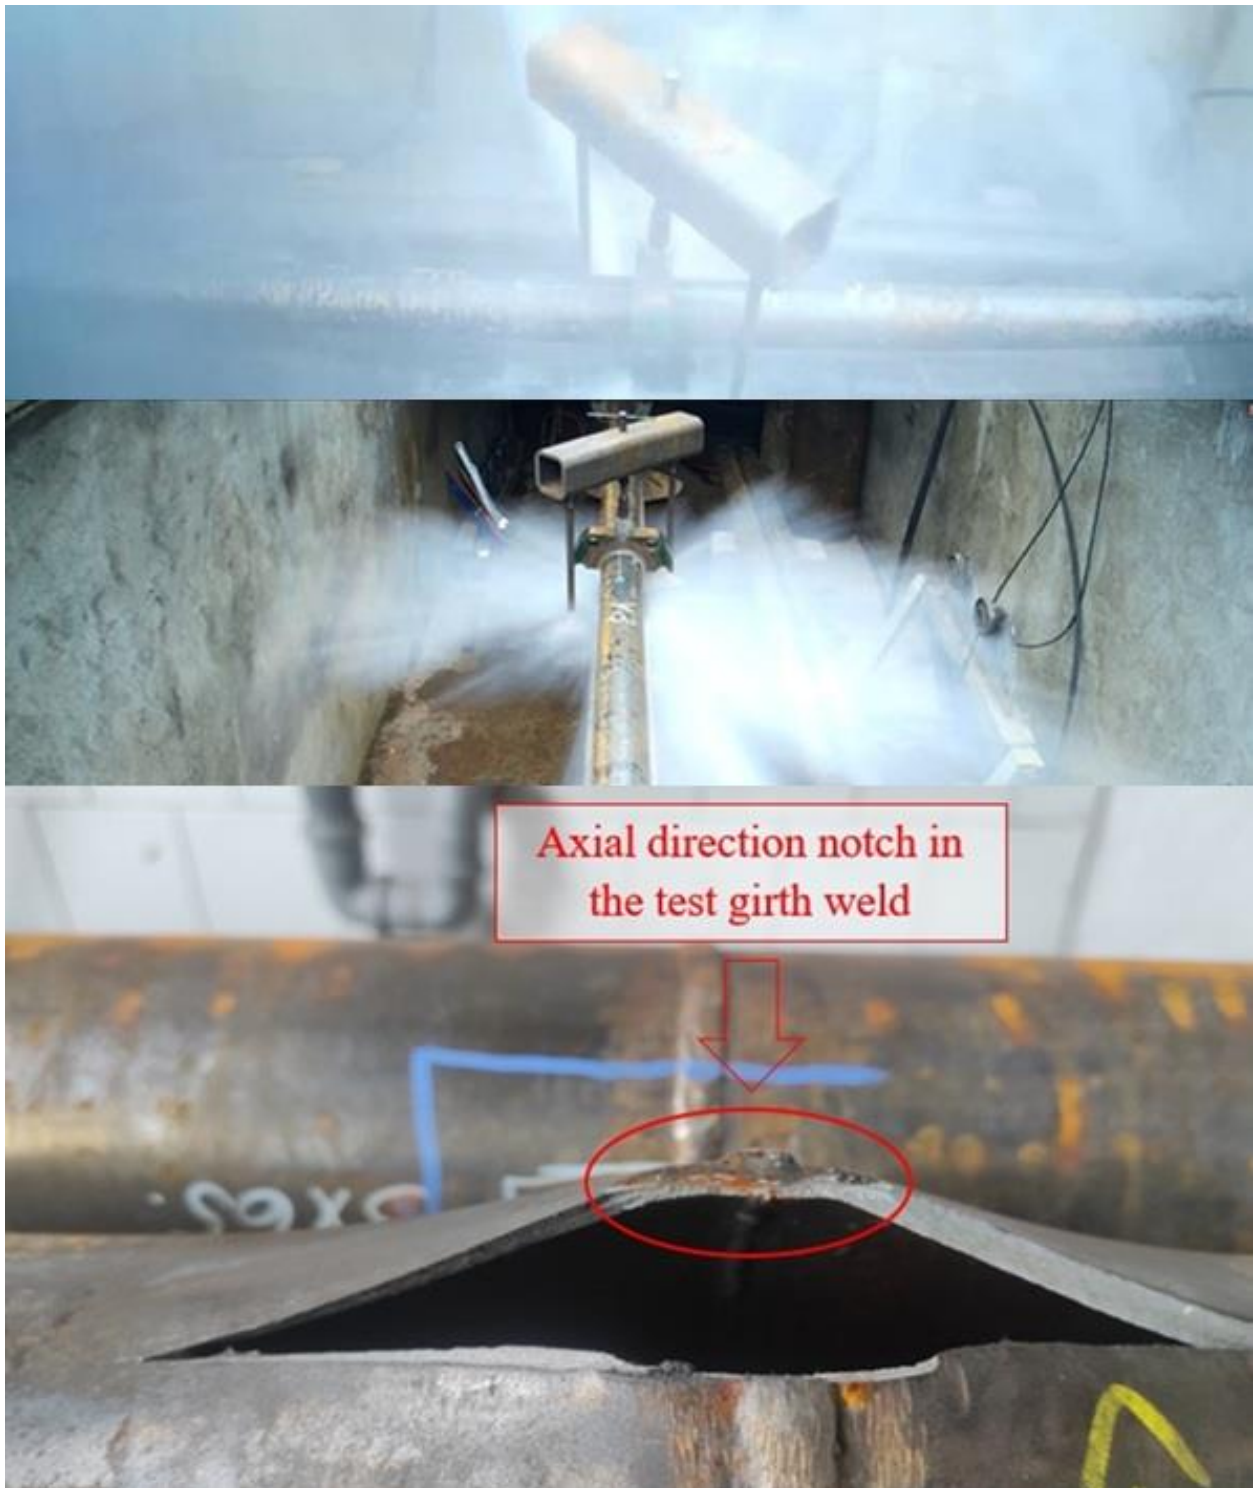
Pipeline section Y6 after burst test: section of pipe (with the burst support beam and the damaged external load transfer device) in the test pit (top), damaged section (bottom)
